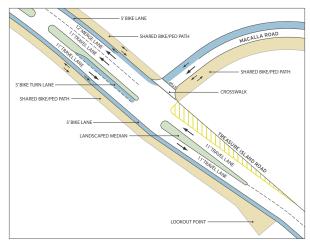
c: Illustrative plan of the intersection of Macalla Road and Treasure Island Road. This illustrative plan adheres to relevant standards and guidelines in the Design for Development.
